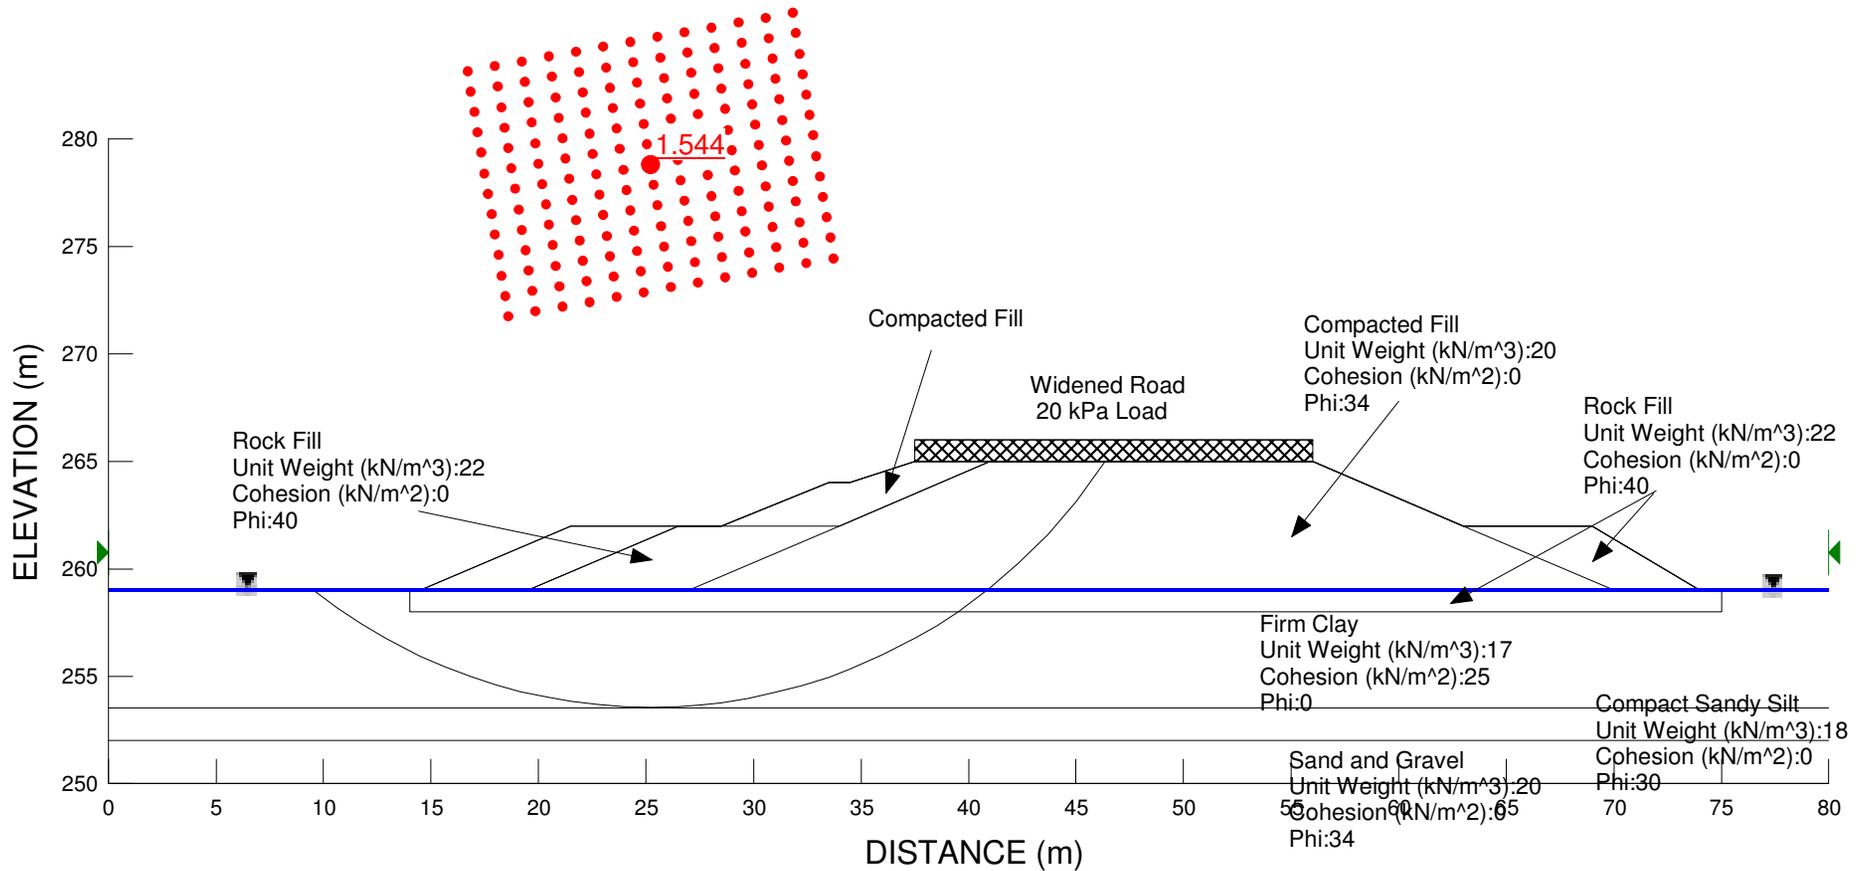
Slope Stability Analysis of Section at Station 18+875 - 3.5 m Road Widening with Extended Berm (End of Construction)
